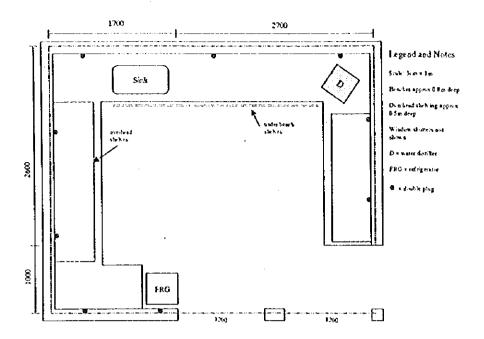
Plan for Field Equipment Room at DOSTE
